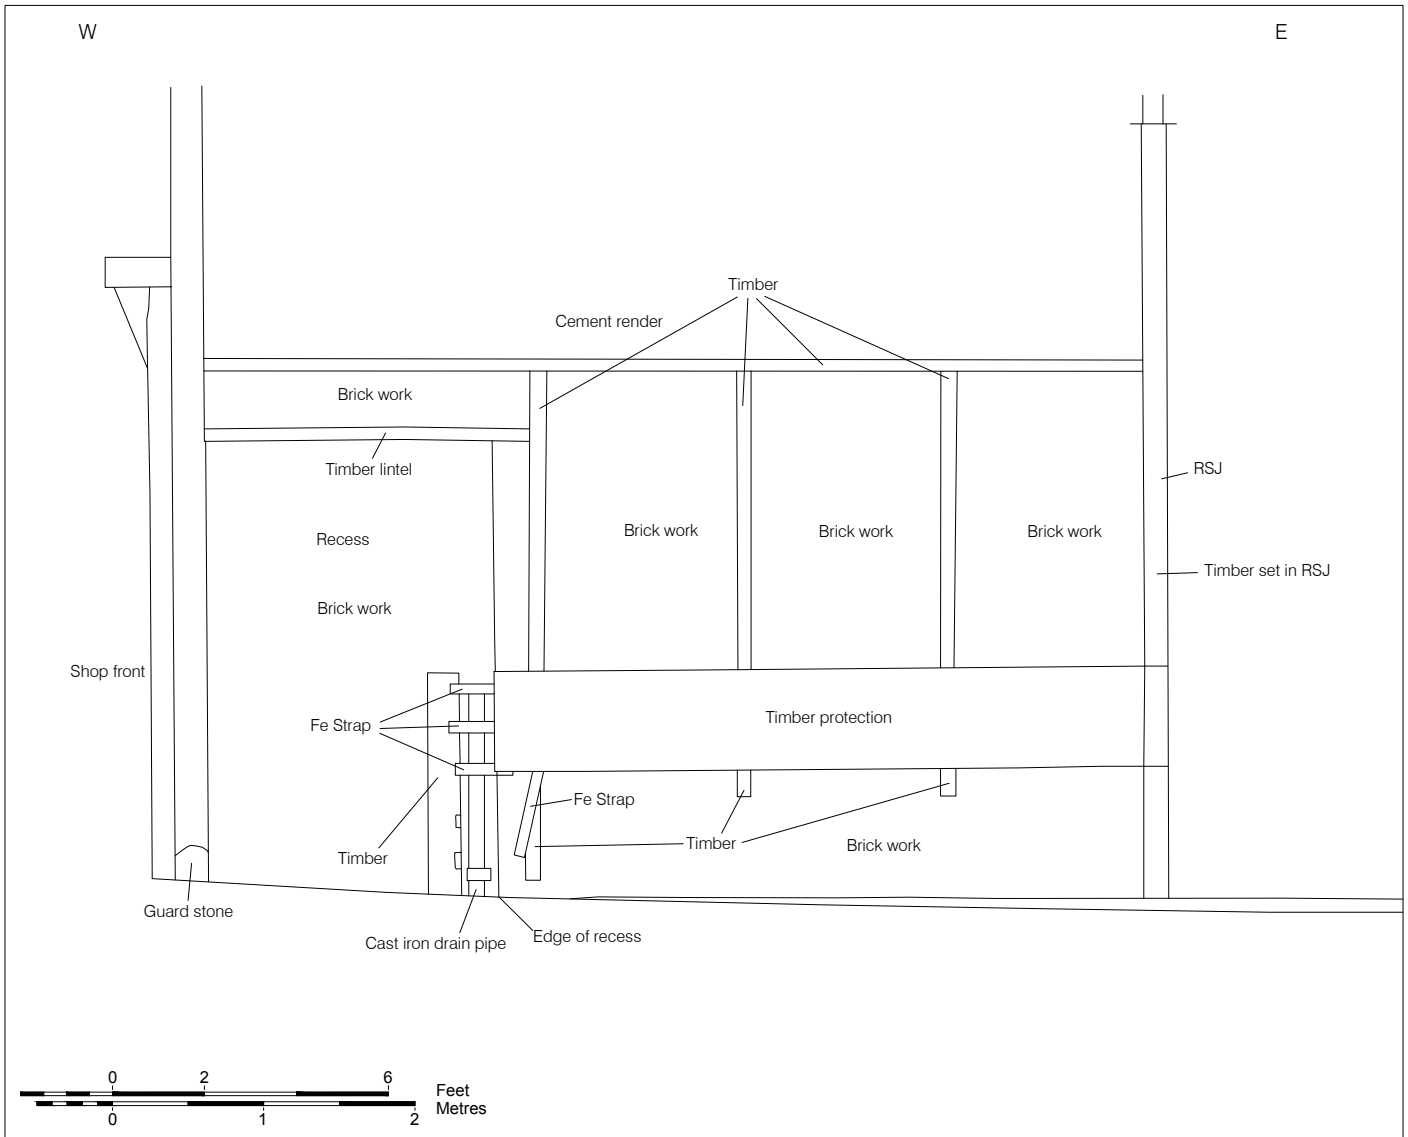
South elevation of no. 127 Borough High Street following the removal of cement render, looking north-west
